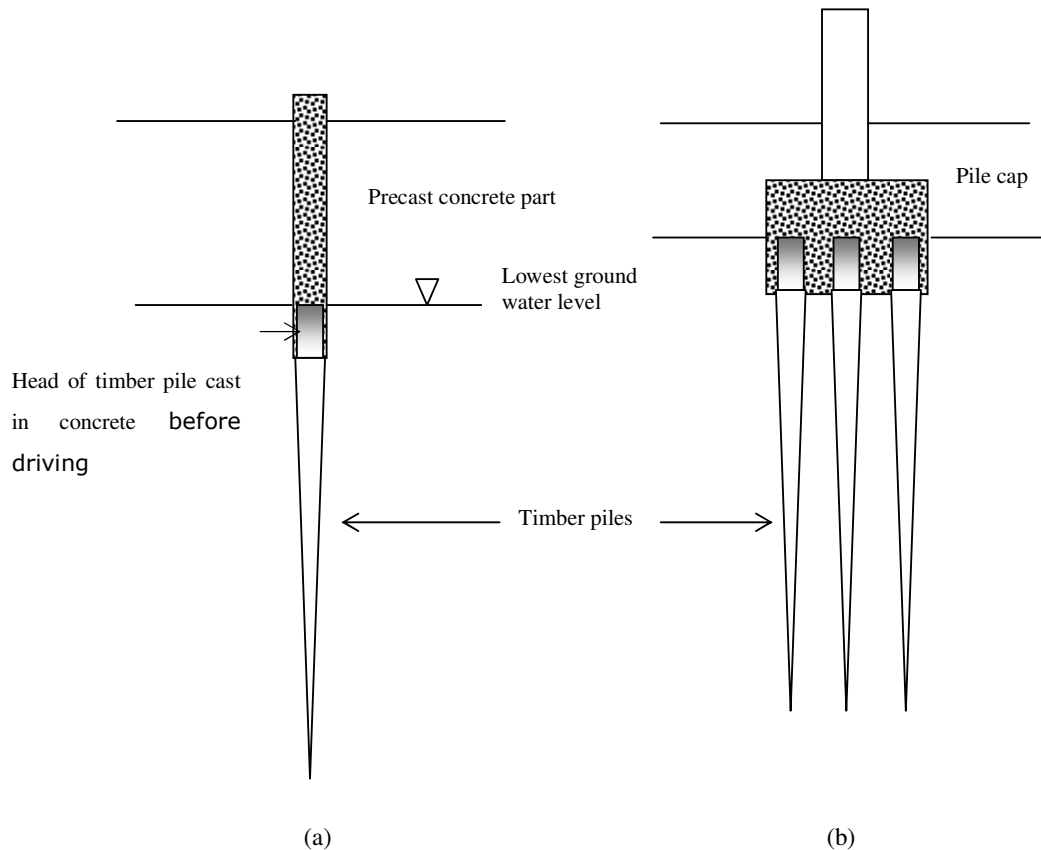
Prevention of timber piles – (a) precast concrete section above water level; (b) extended pile cap below water table level (Tomlinson, 1994)
